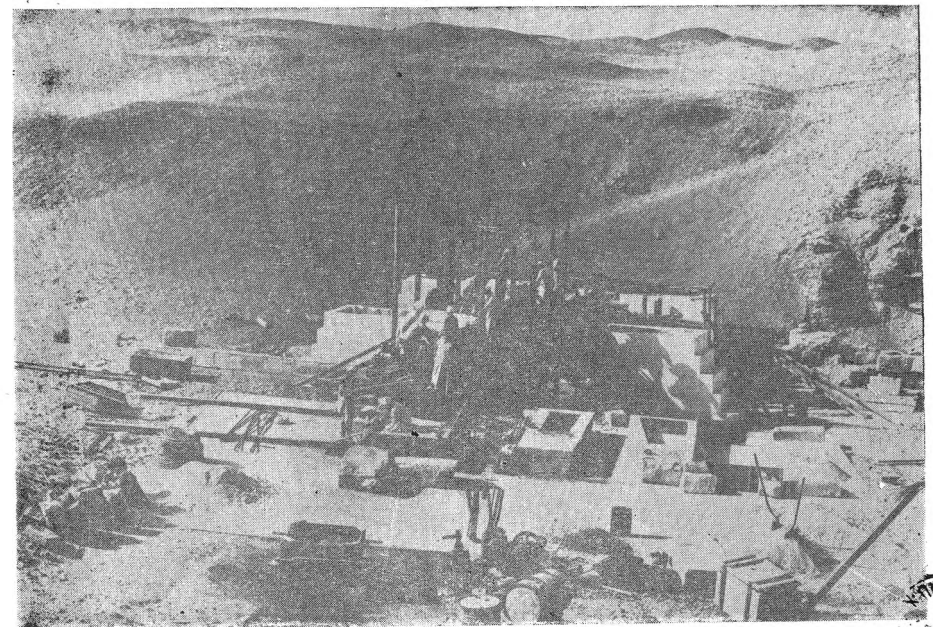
The moulding operation of the slabs. Two original slab's fragments can be noted, with a space in between for a new slab.
